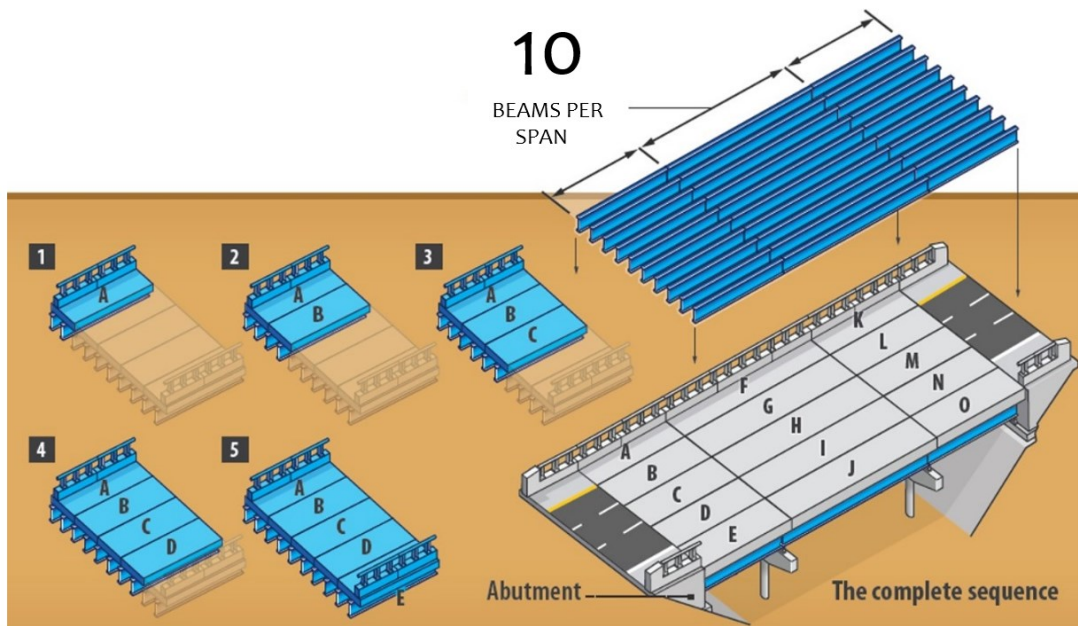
Construction Sequence for the I-635 Bridge over Old Seagoville Road in Dallas [22].
